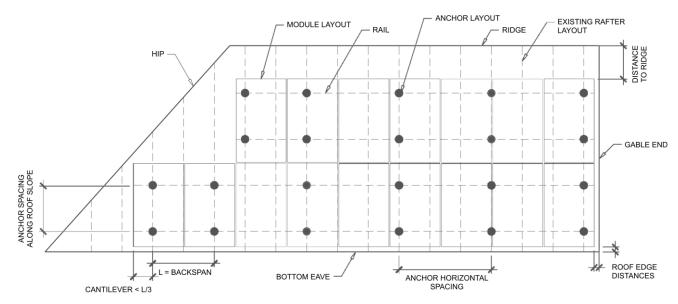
SAMPLE SOLAR PANEL ARRAY AND ANCHOR LAYOUT DIAGRAM (ROOF PLAN)
